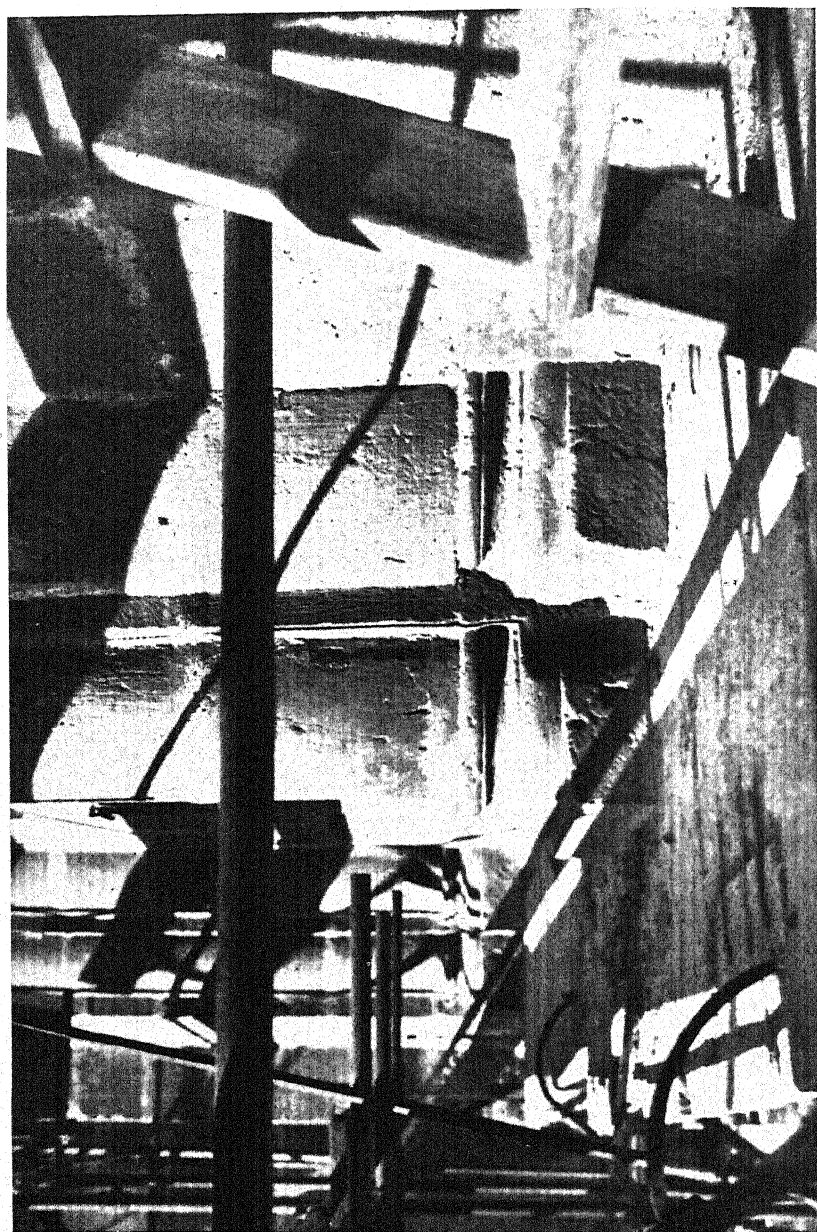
CRACKED BASES OF PIERS OF UPPER ARCADE
